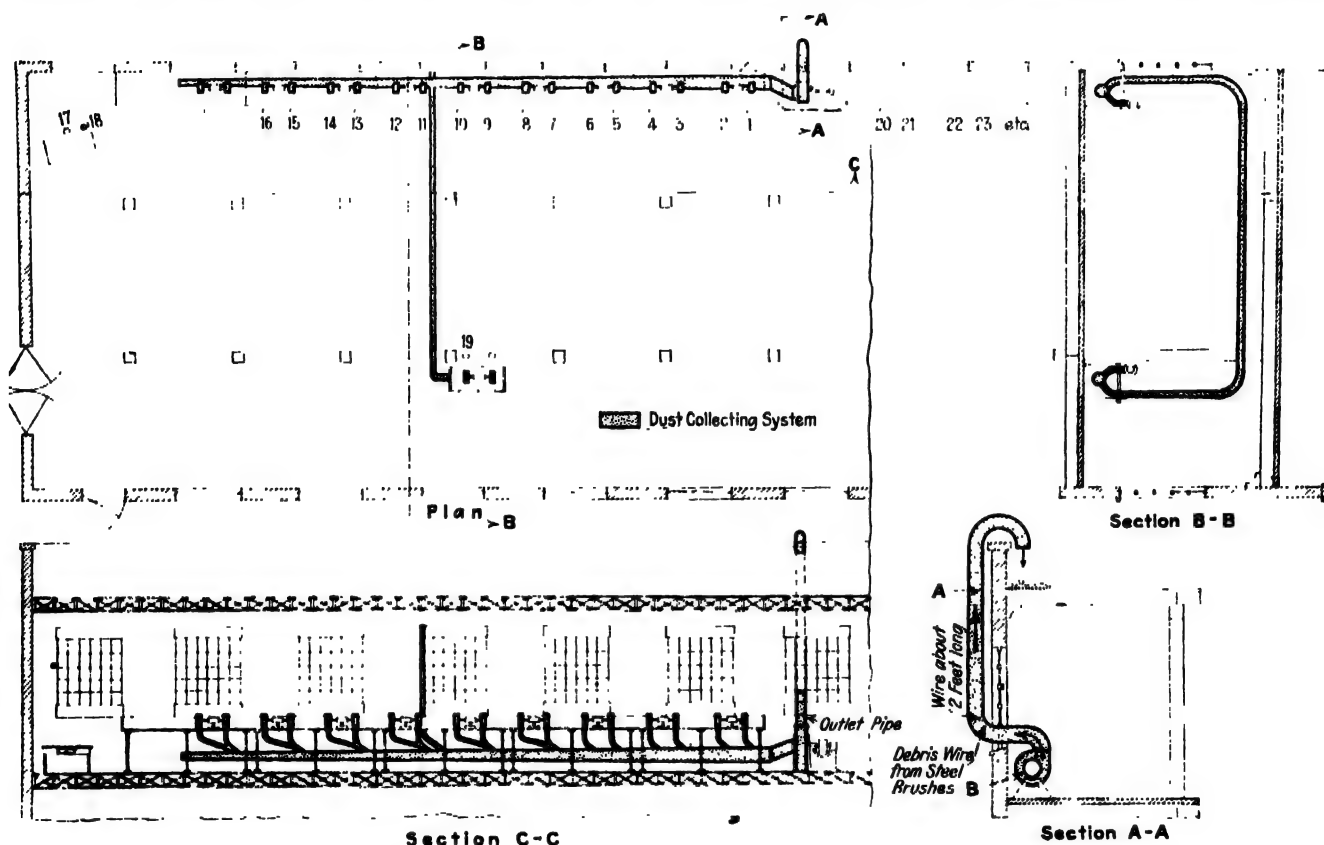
PLAN, ELEVATION AND SECTION OF OLD SATIN-FINISH DEPARTMENT, SHOWING THE DUST-COLLECTING SYSTEM
